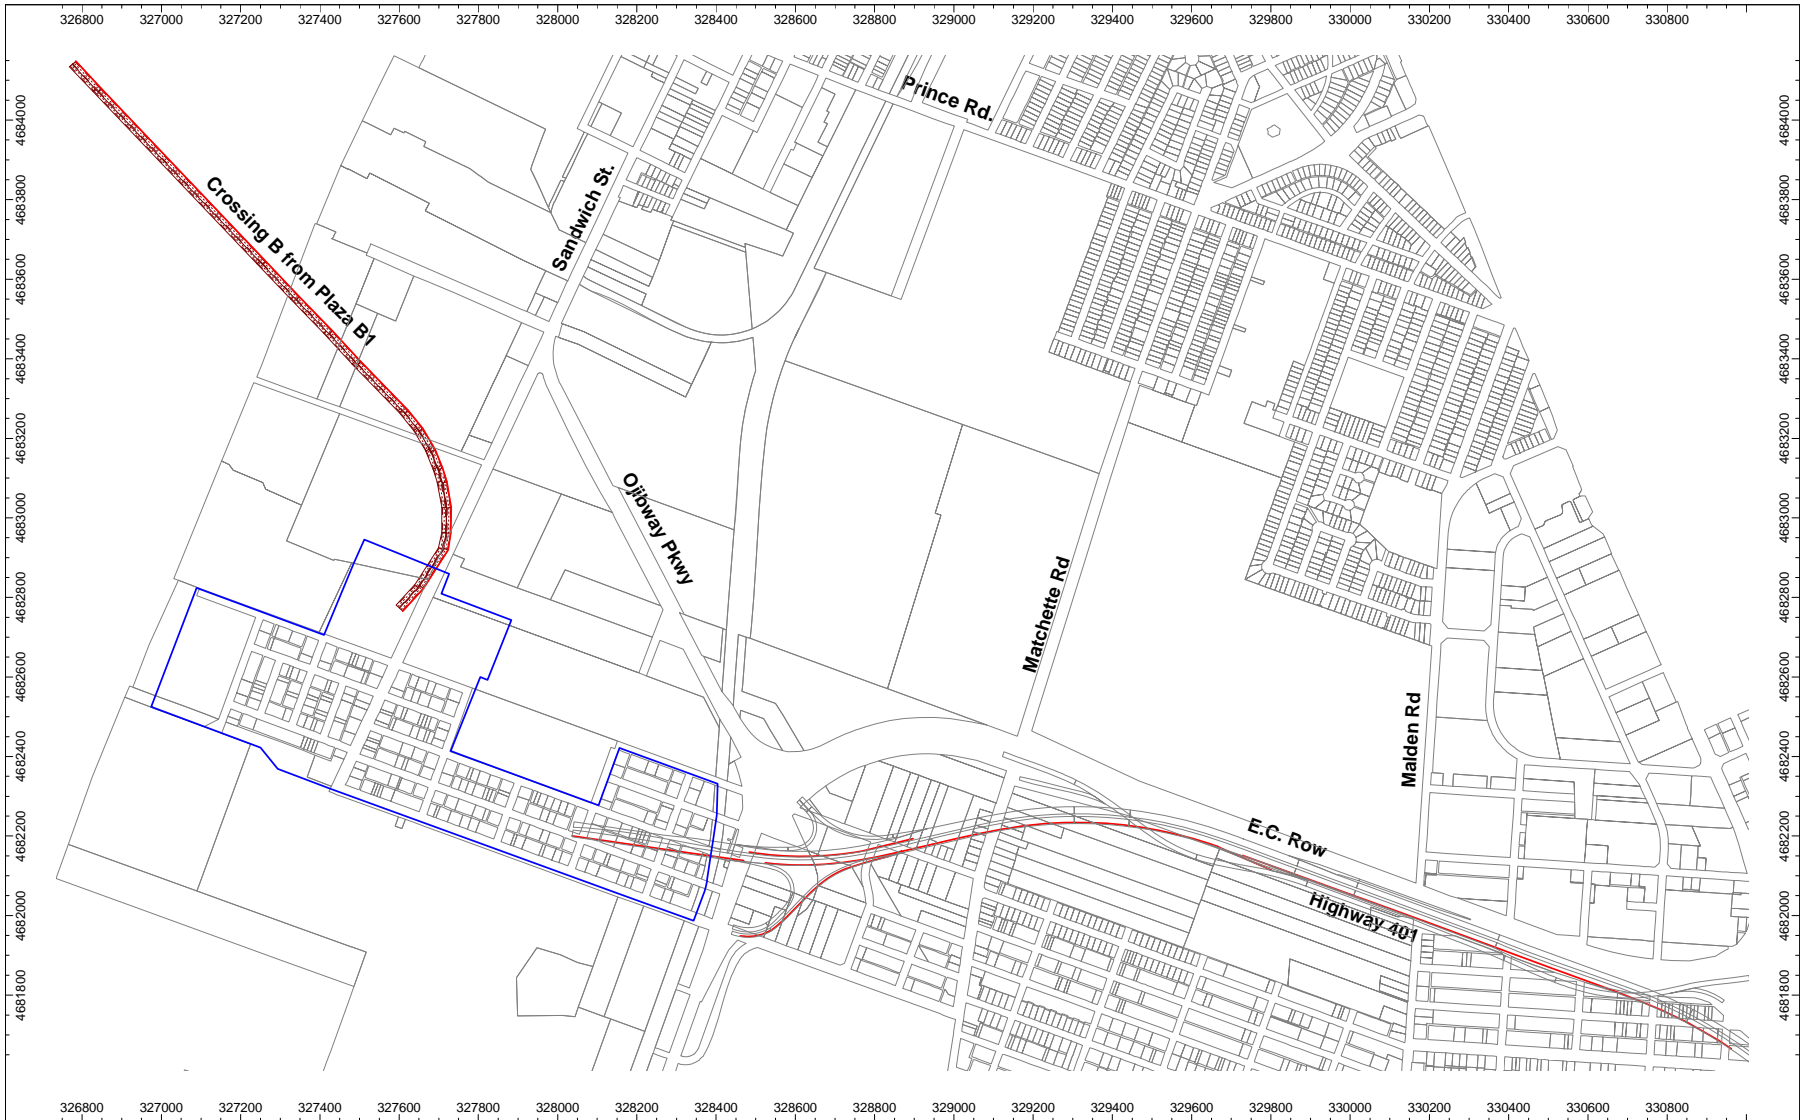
PLAZA B1 CROSSING B – OJIBWAY PARKWAY TO MALDEN ROAD – DAYTIME 2035 – 5 M BARRIER ON APPROACH AND 4 M BARRIER ON CROSSING
